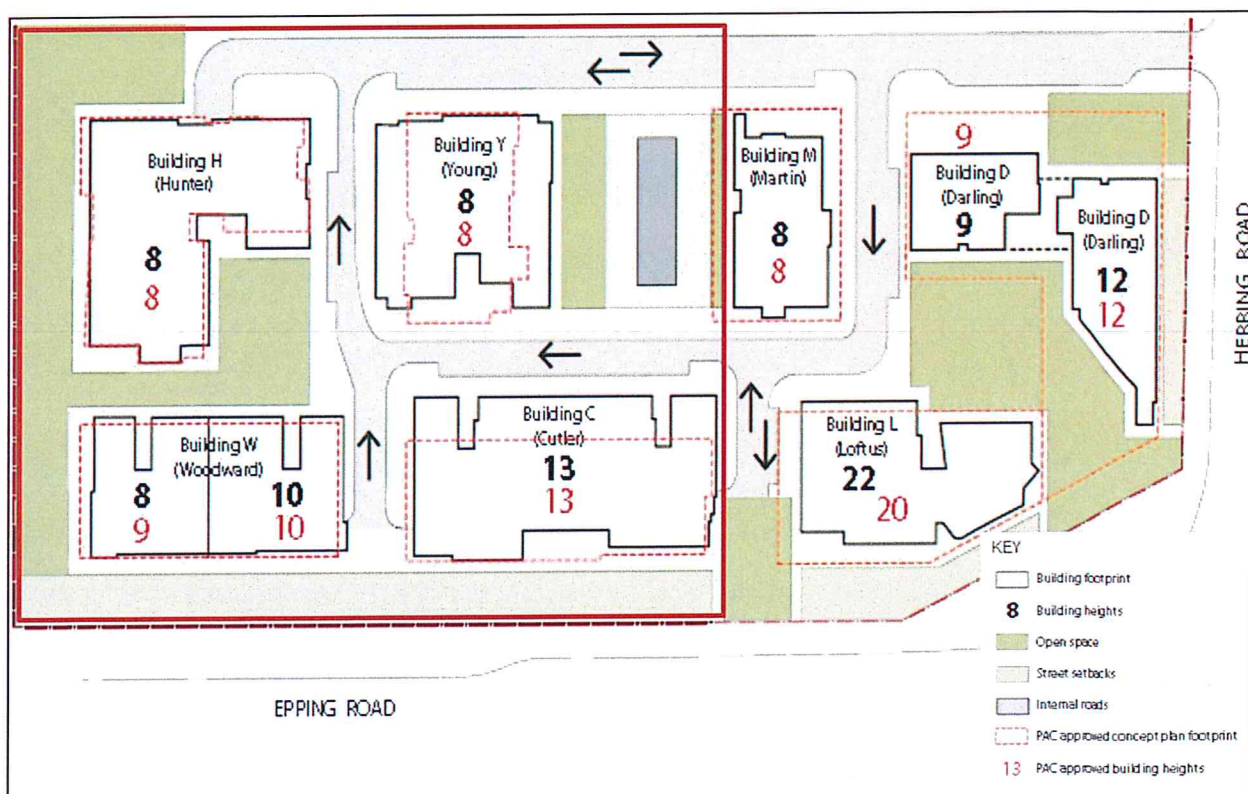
Approved modified layout (Stage 1 Project Approval shown in red outline)
